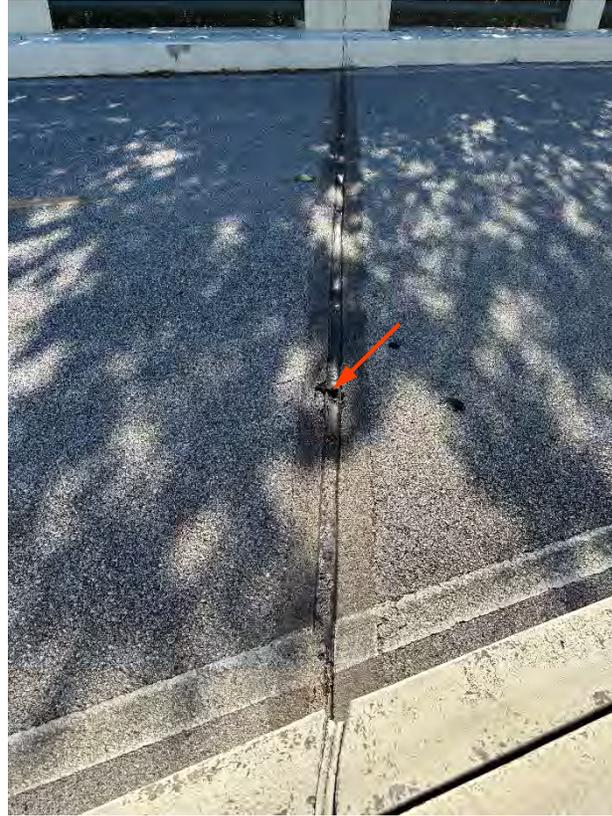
EXP. JT. 4, ADHESION FAILURE, RUTTING
